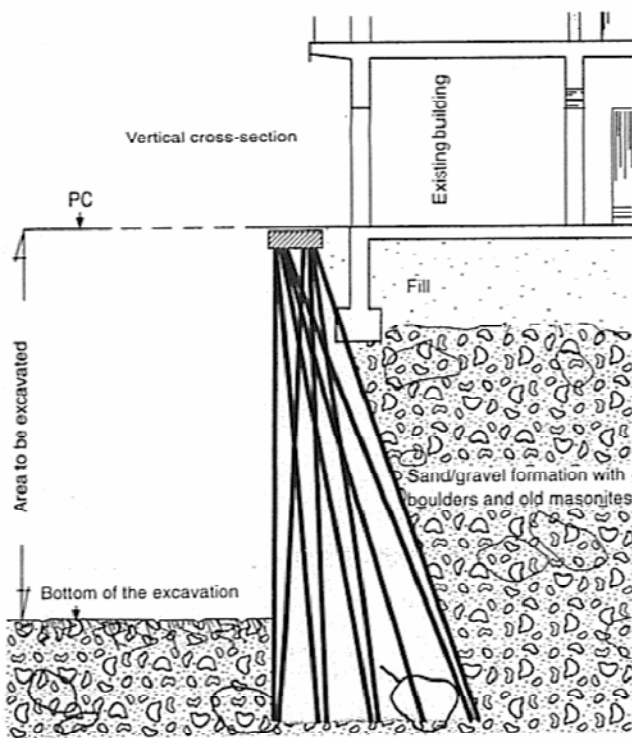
Typical scheme for a reticulated network for the protection of a building during a deep excavation in close proximity (Lizzi, 1982)
